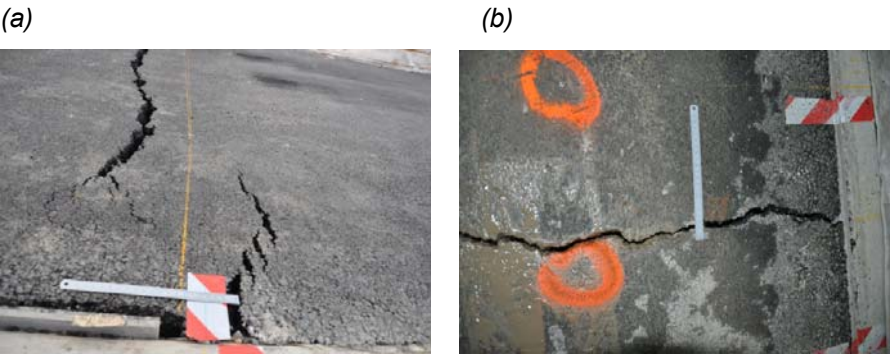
Measurement of (a) the longitudinal displacement between the pavement and the lateral wall; (b) the crack width
